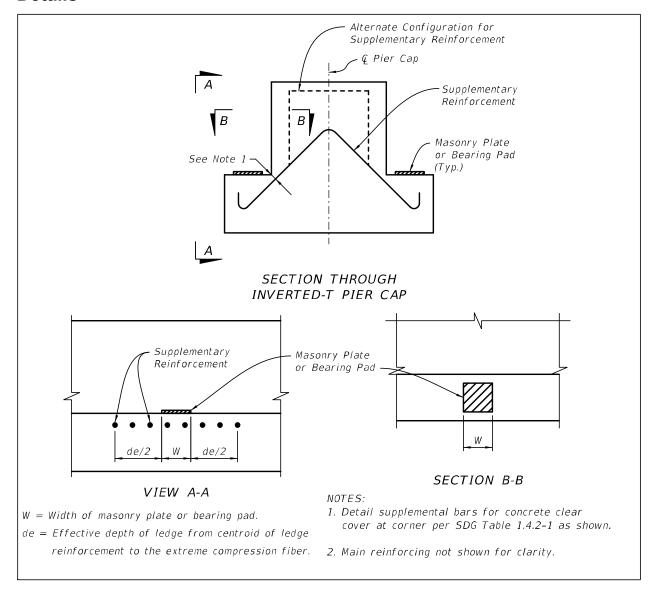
Inverted-T Pier Cap Supplementary Reinforcement Details
